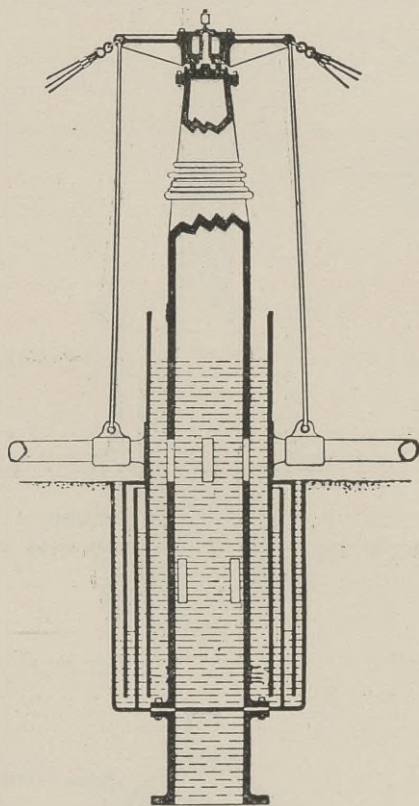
Section through Centre Pillar of Circular Distributor with Air Lock.
